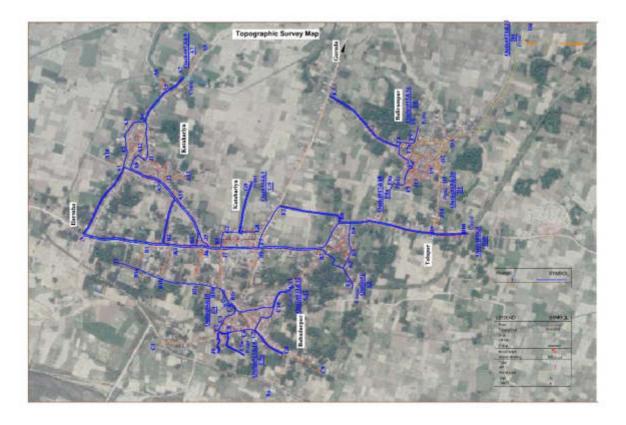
Figure IV-I: Overall Storm Sewer Network Plan under Phase 1
